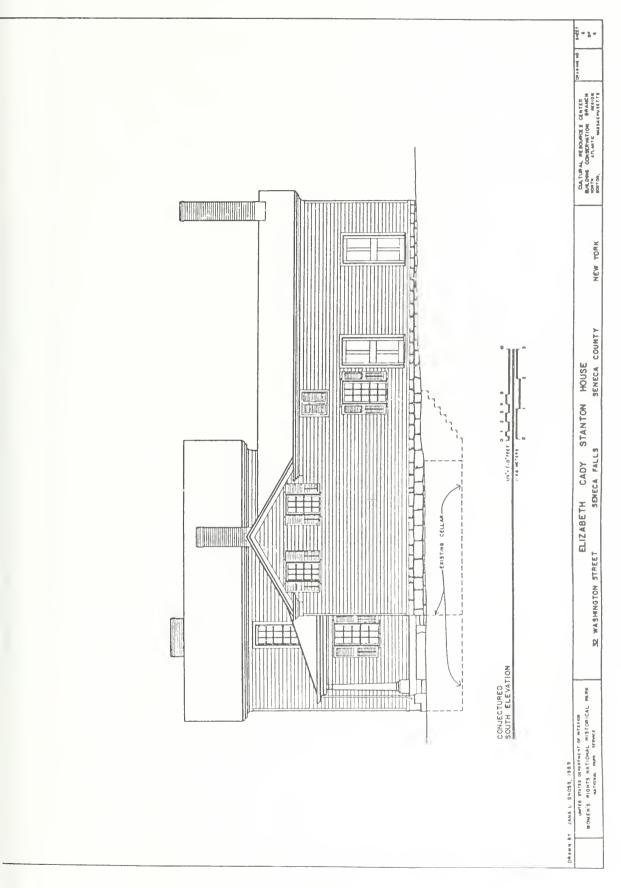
Stanton House: south elevation (conjectural view), circa 1847-62.
